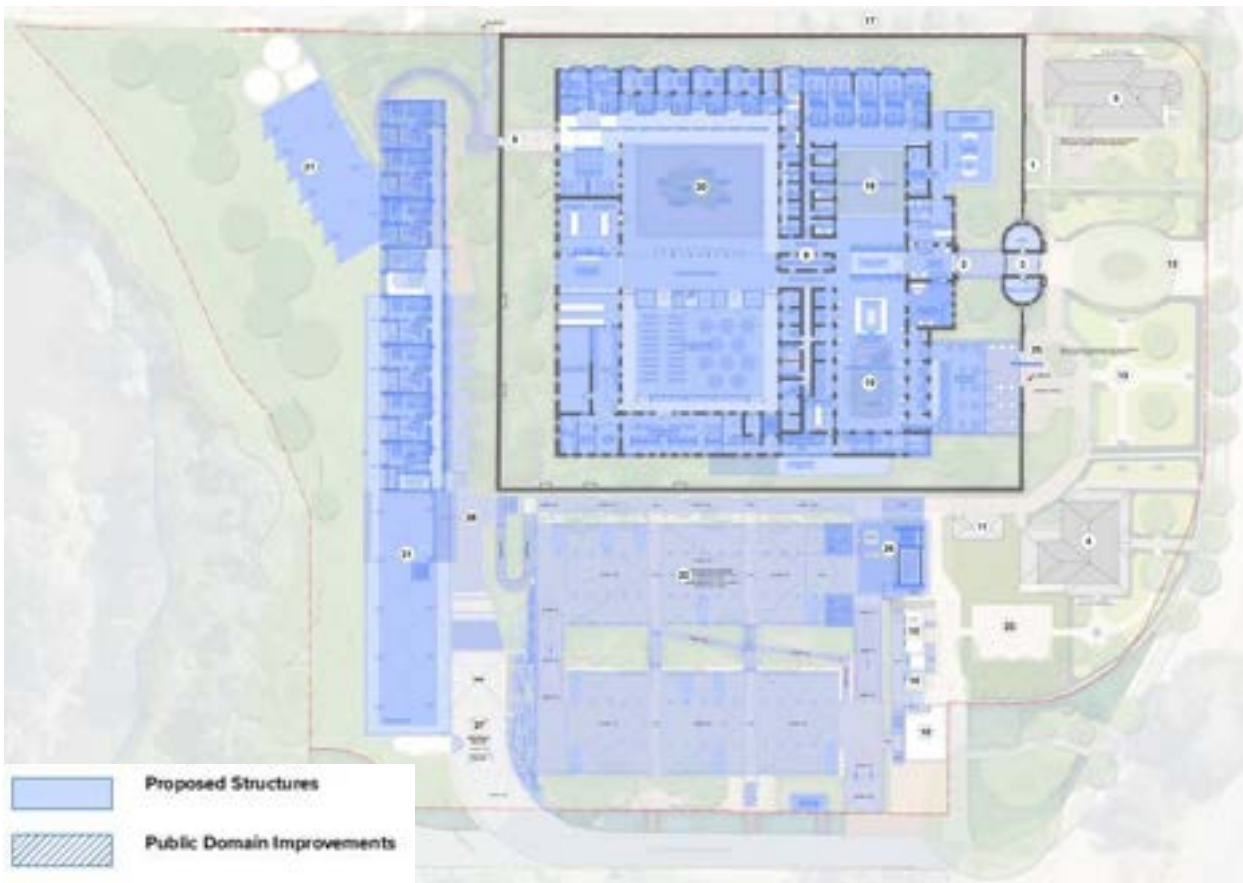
Extract of proposed drawings – *Additions Site Plan (DA-050-300)
